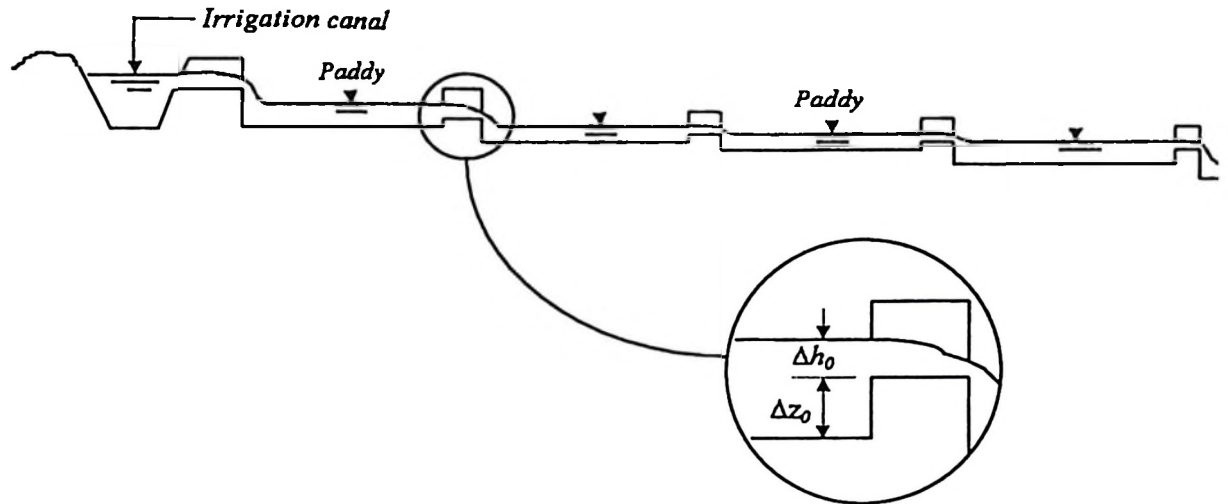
A typical cross section of paddy-to-paddy water movement
